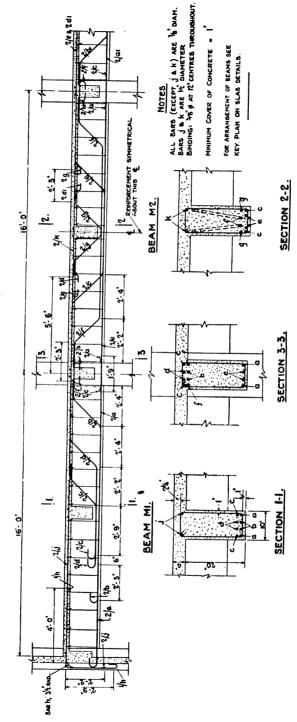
DETAILS OF FLOOR MAIN BEAMS.
